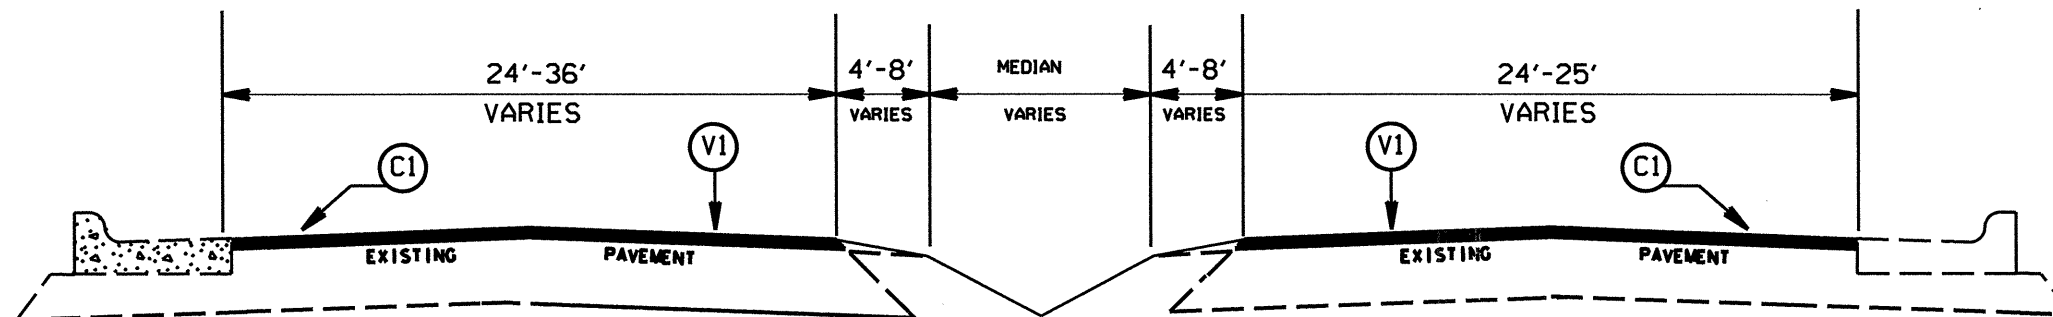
DETAIL FOR PROFILE MILLING (0' TO 2.0')
